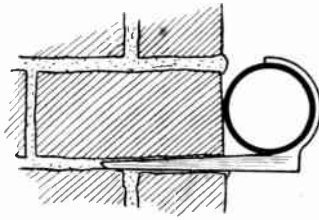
A PIPE HOOK FOR FIXING CONDUIT. This is sunk in the plaster, etc.
